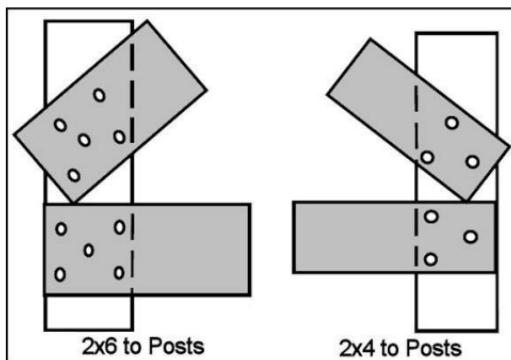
Nailed Connections for 2"x6" Brace to Header.
